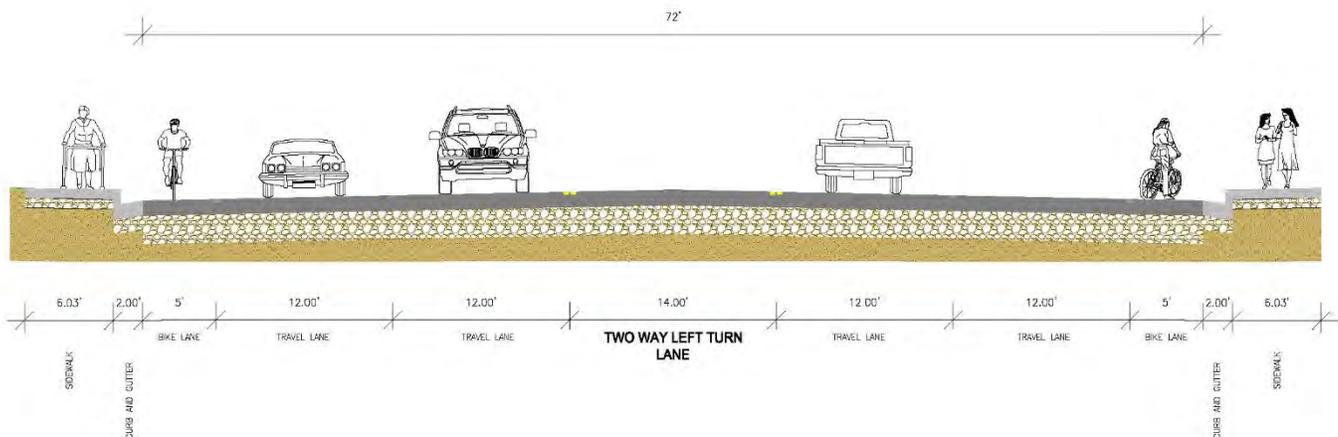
Proposed Eagle Canyon Drive Widening Section
